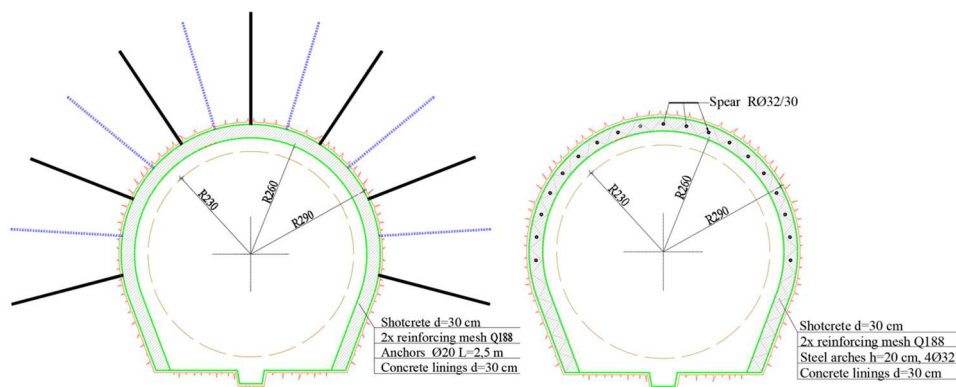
Tunnel type with shotcrete and anchors (left), shotcrete, steel arches and spears (right)
